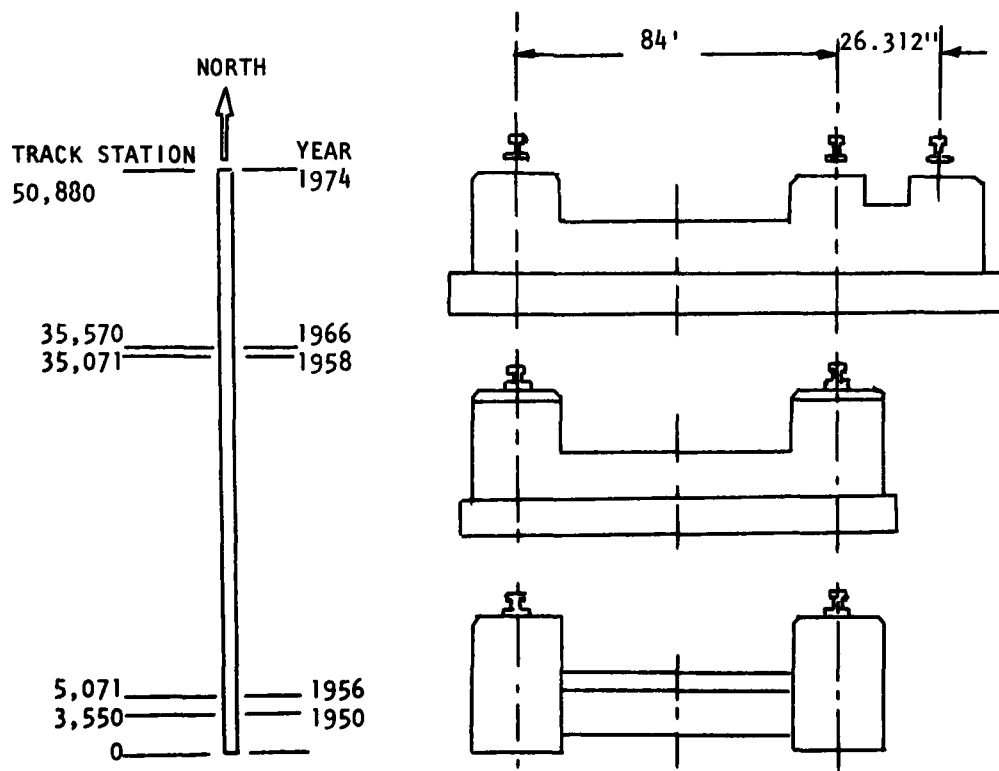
TRACK LAYOUT AND GIRDER CROSS SECTIONS
